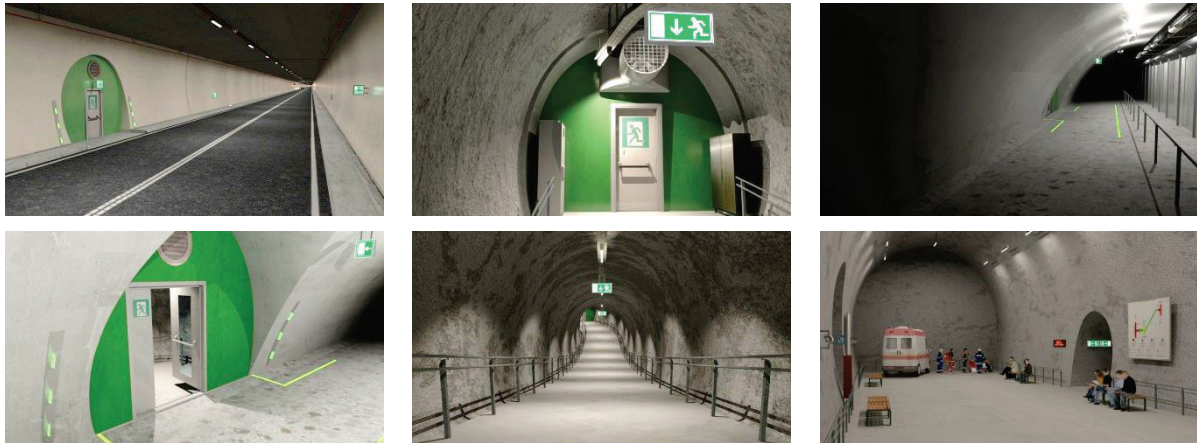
Images of the new egress way as well as of the connection between traffic room and egress way via fresh air duct (source ASFiNAG)
